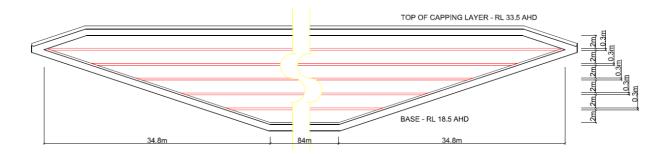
FIGURE P – AUTOCAD SKETCH USED FOR CROSS SECTION CALCULATIONS
